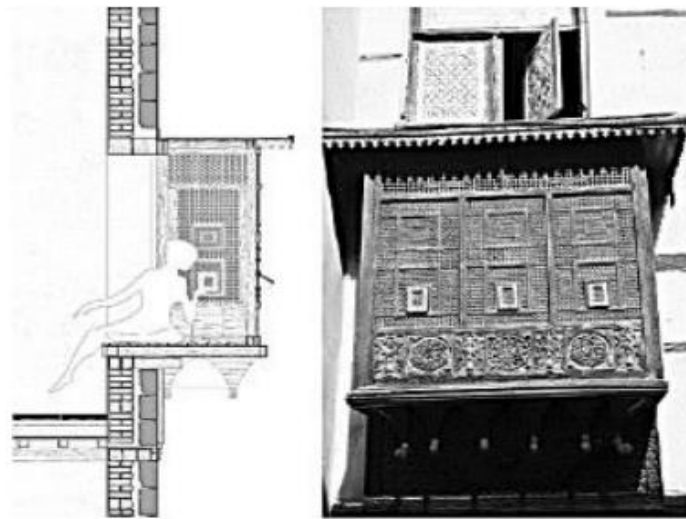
Section and façade view of a *Mashrabiya* (Ficarelli, 2008)
